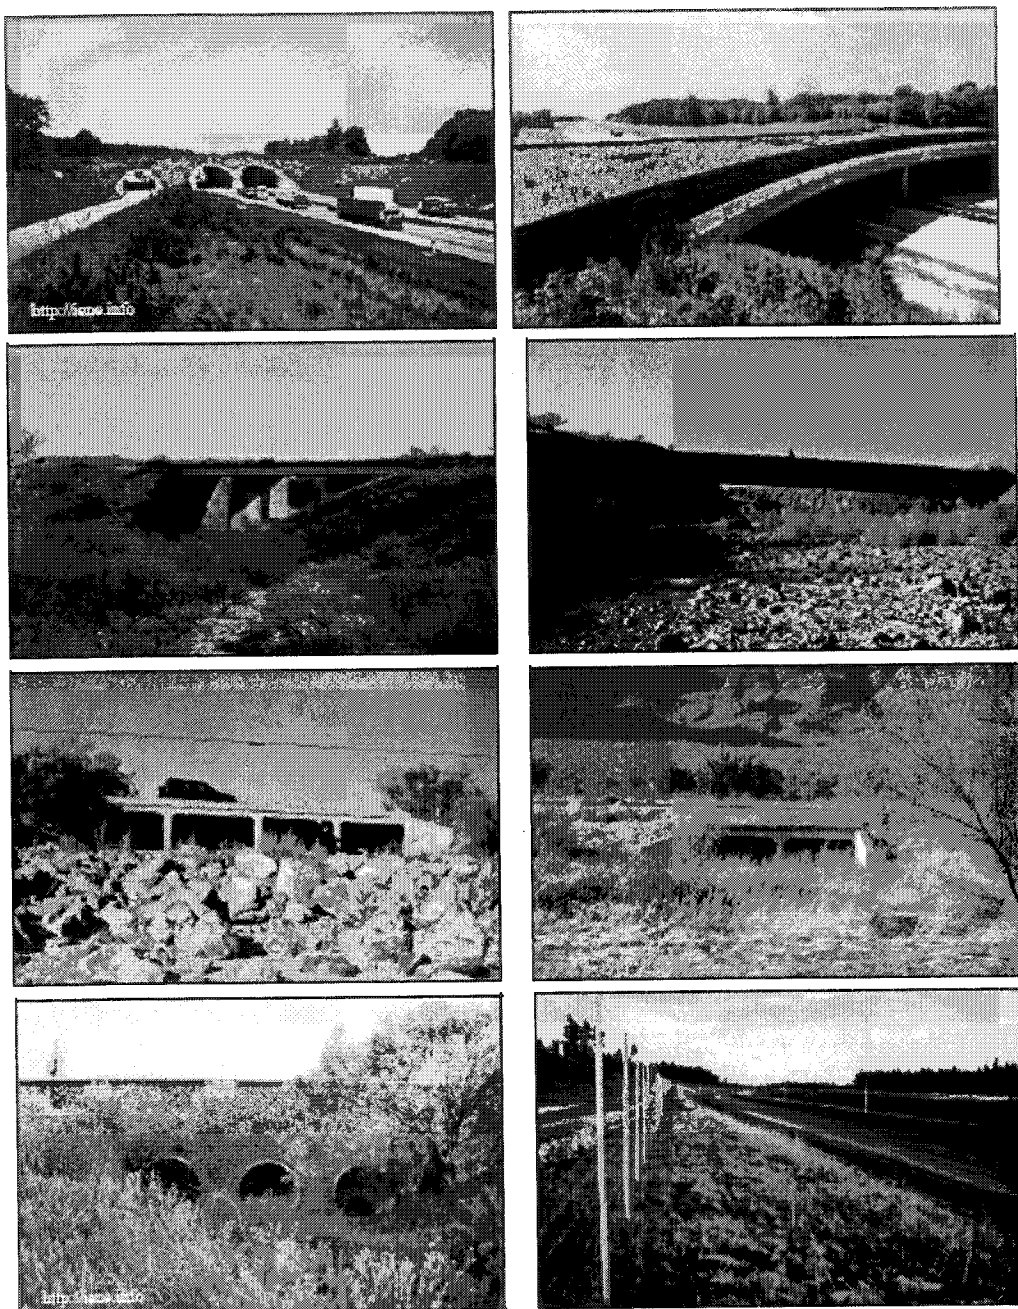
Potential road mitigations (from top to bottom) include: highway overpasses, bridges, culverts, and drainage pipes. Fencing (lower right) should be used to guide animals into crossing structures.
